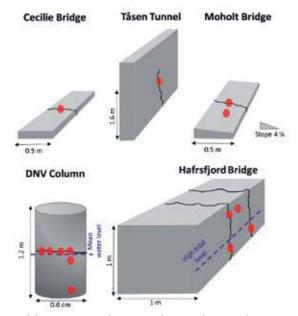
Illustration of the investigated structural parts showing the concrete surface and crack orientation. Locations were cores where taken are illustrated in red.
